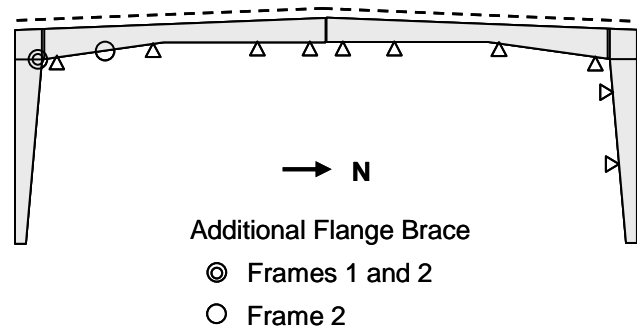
Flange Brace Reinforcement and Addition after First 2% Drift
